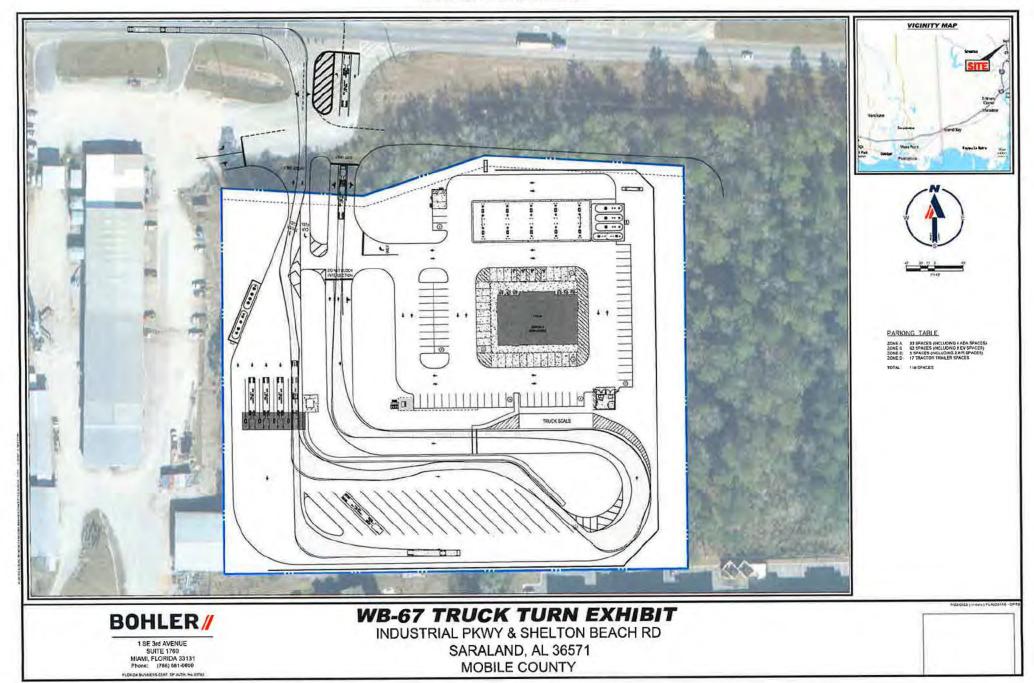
Proposed Site Plan for the Store/Gas Station Truck Stop, Aerial View
